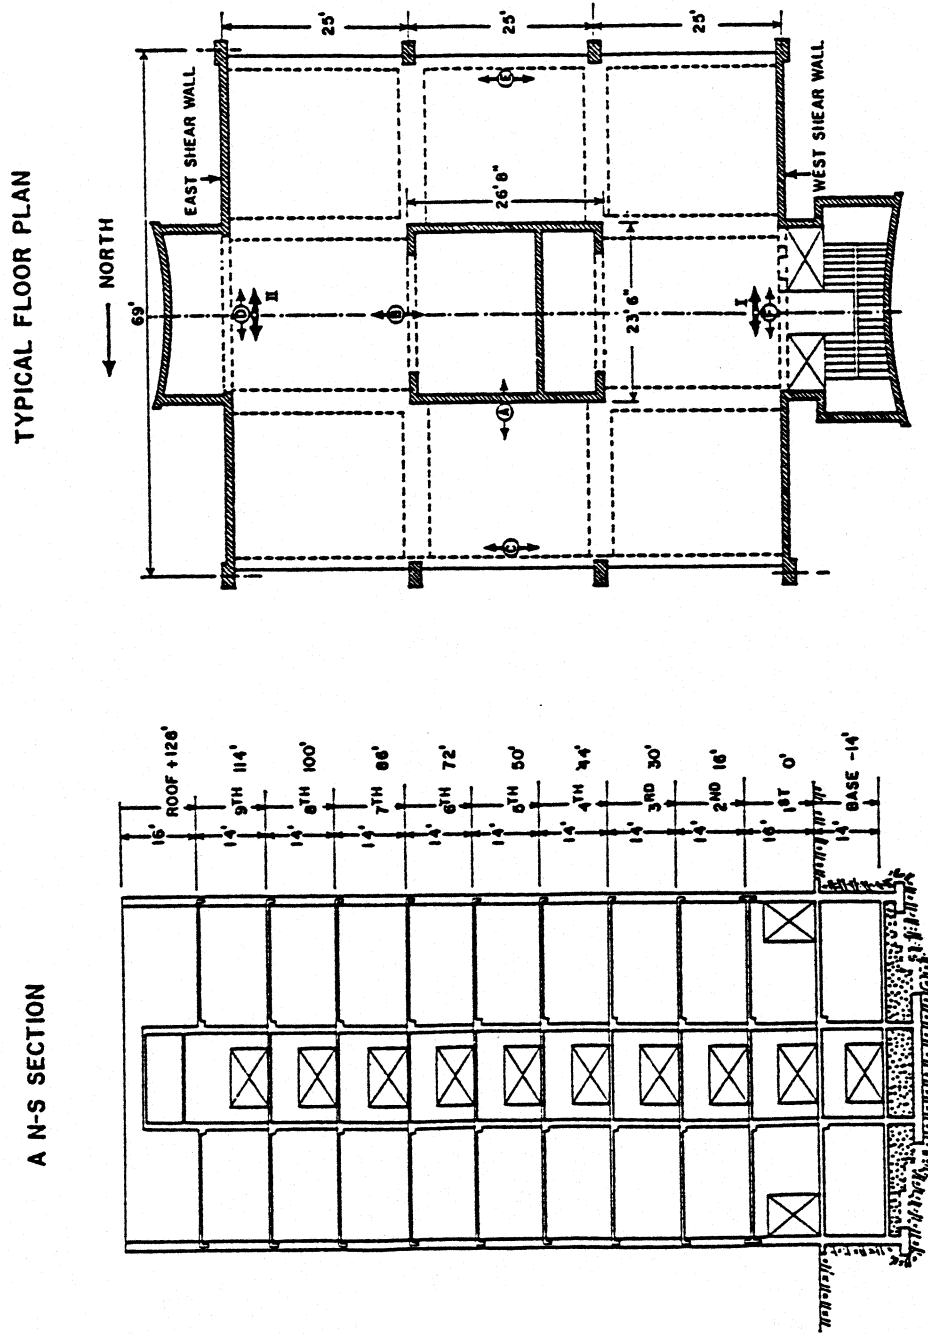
A NS section and a typical floor plan of the Millican Library at Caltech in Pasadena (after Trifunac, 1972).
